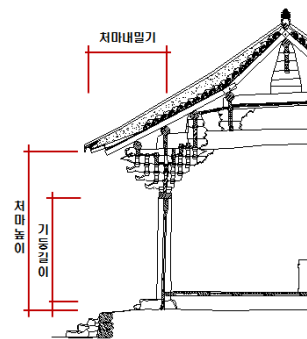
Relation Analysis to 3Kan Building Floor space & Column size
